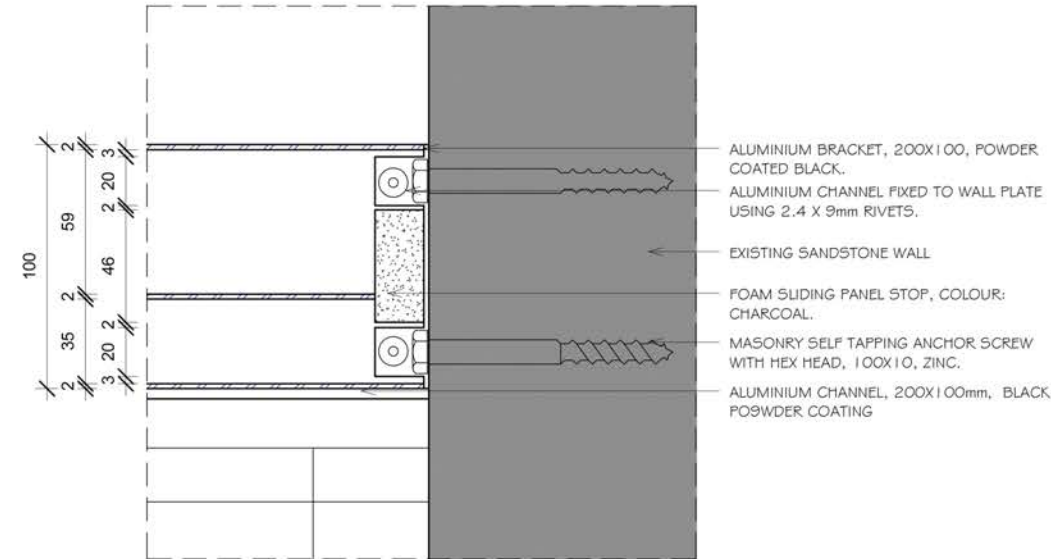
Detail 5 grid wall plate, not to scale (Author 2018)
